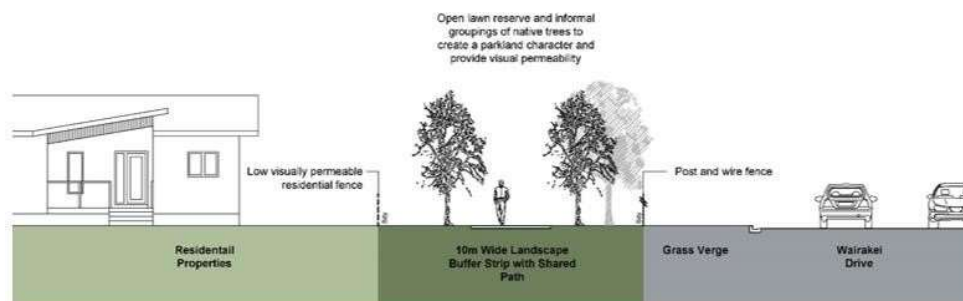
C: Cross section illustrating the 10m wide Landscape Buffer Strip with Shared Path to the Wairakei Drive road frontage design
